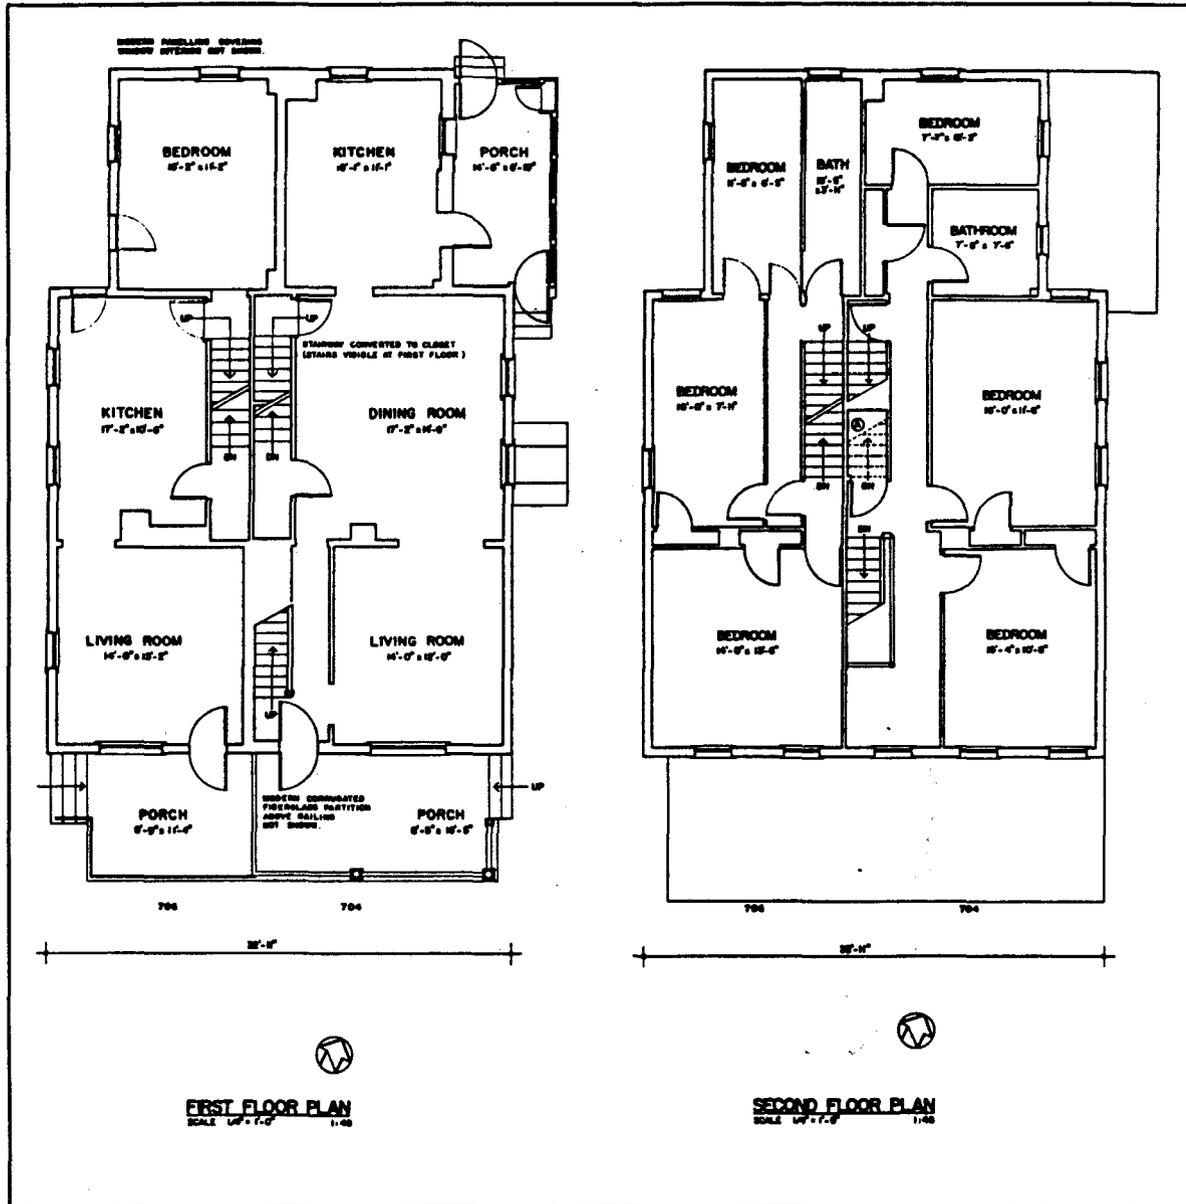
First-floor plan, drawn by Pat Reese and second-floor plan, drawn by Paul J. Skeet, June 1989.
